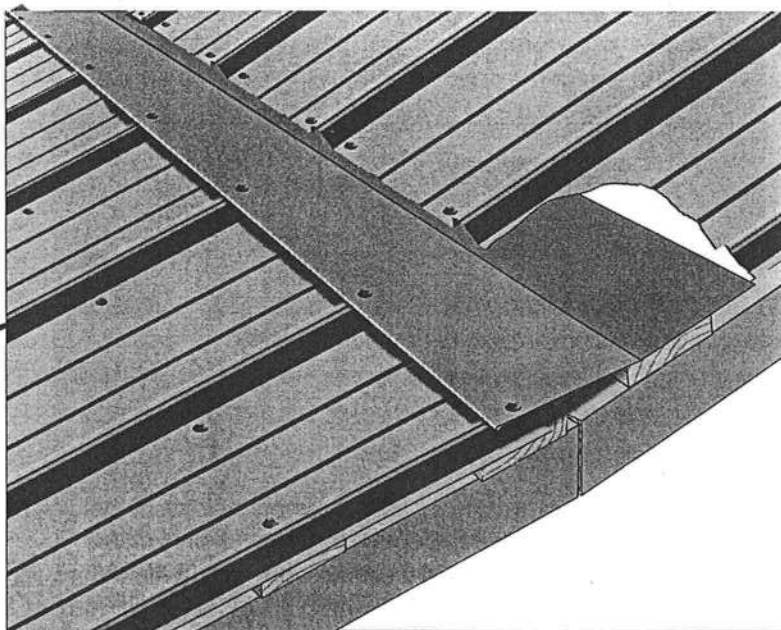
The transition flashing provides a continuous drainage where two slopes meet.
